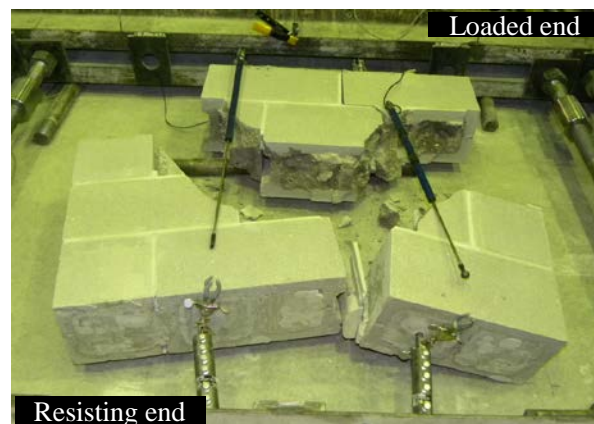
Splitting failure of the masonry assemblage observed in specimen P150-4.
